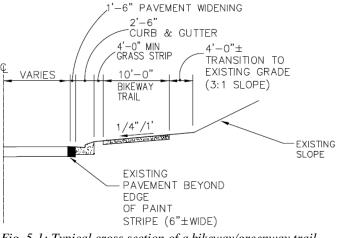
Typical cross section of a bikeway/greenway trail within street right-of-way.
